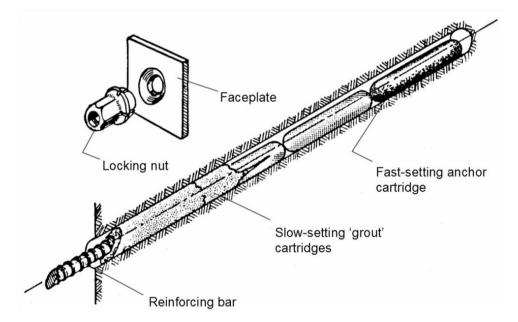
Typical set-up for creating a resin anchored and grouted rockbolt. Resin grouting involves placing slow-setting resin cartridges behind the fast-setting anchor cartridges and spinning the bolt rod through them all to mix the resin and catalyst. The bolt is tensioned after the fast-setting anchor resin has set and the slow-setting resin sets later to grout the rod in place.
